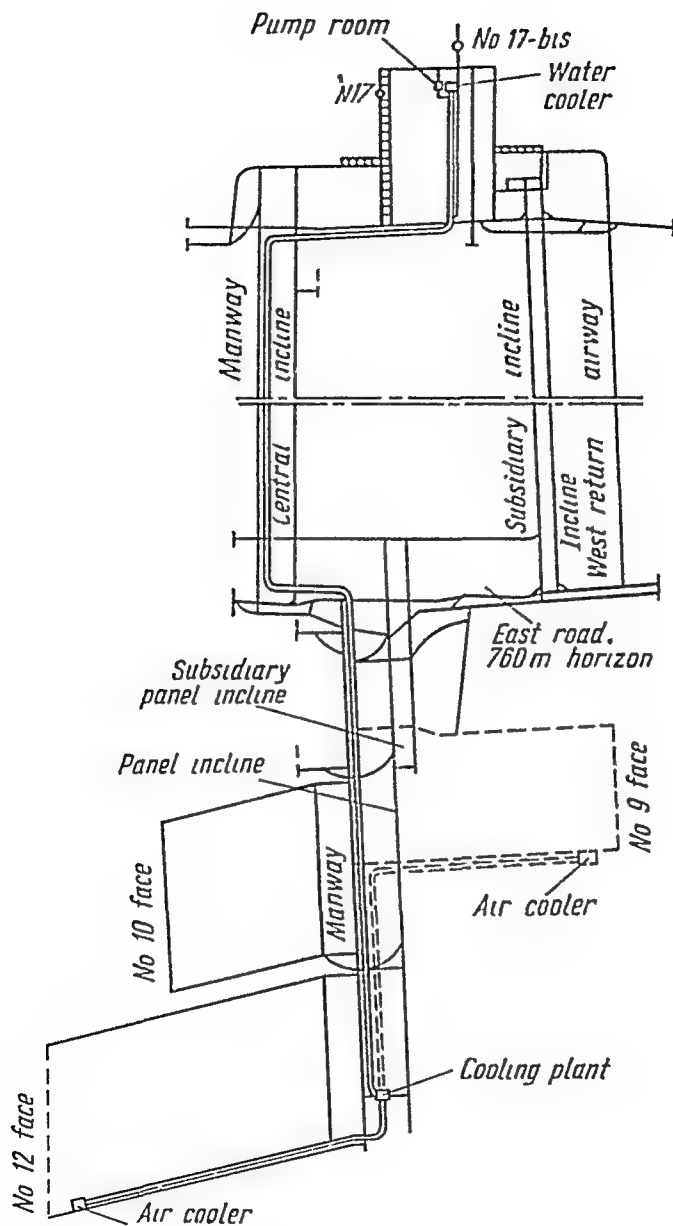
Layout diagram of pilot underground cooling plant at No 17, 17-bis Mine in the Donets Basin
